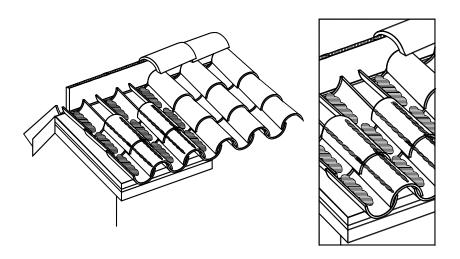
Placement Detail "D" Two-Piece Profile Roofing Tile
